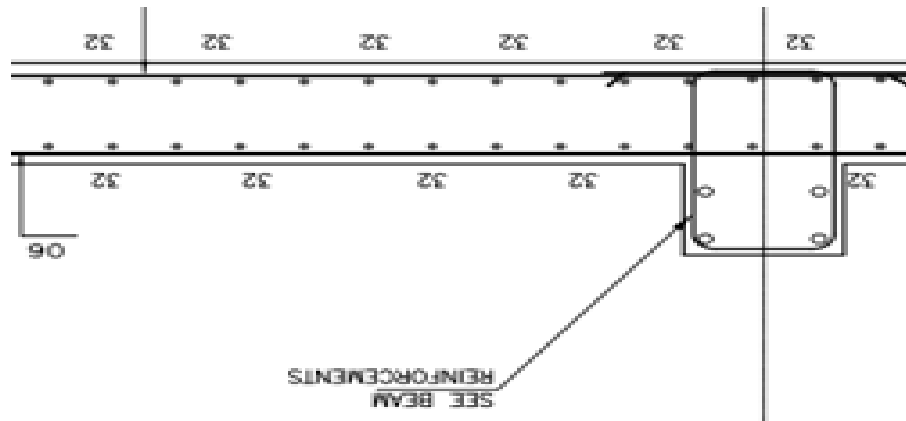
SLAB AND BEAM (DOWN STAND BEAM) RAFT FOUNDATION
